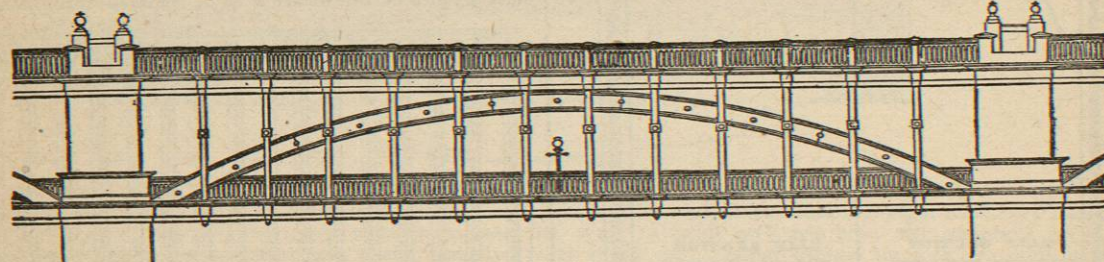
Elevation of Bowstring Arch, High-Level Bridge, Newcastle
